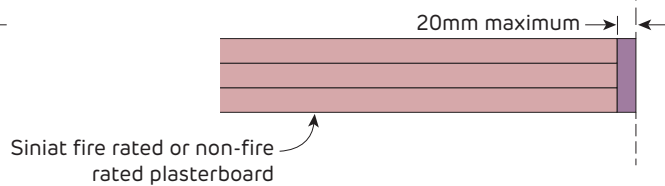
Finishing Detail - Bare finish with Sealant Section
